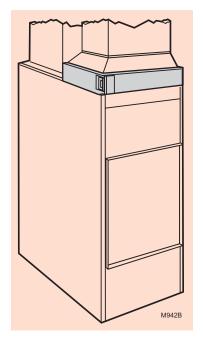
Lowboy furnace, with media air cleaner mounted horizontally in return plenum just above furnace and opposite heating plenum.
